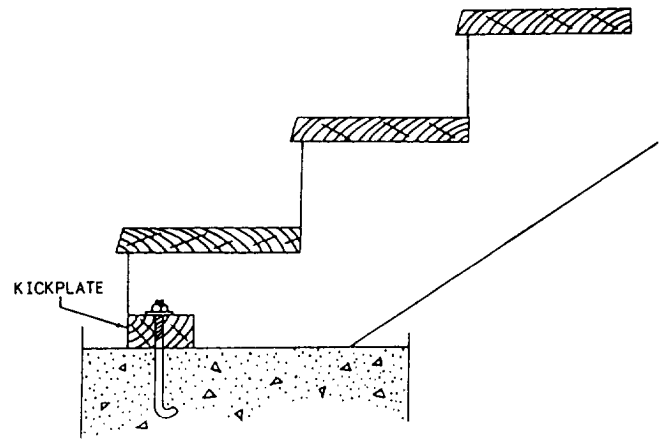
Kickplate for anchoring stairs to concrete.
